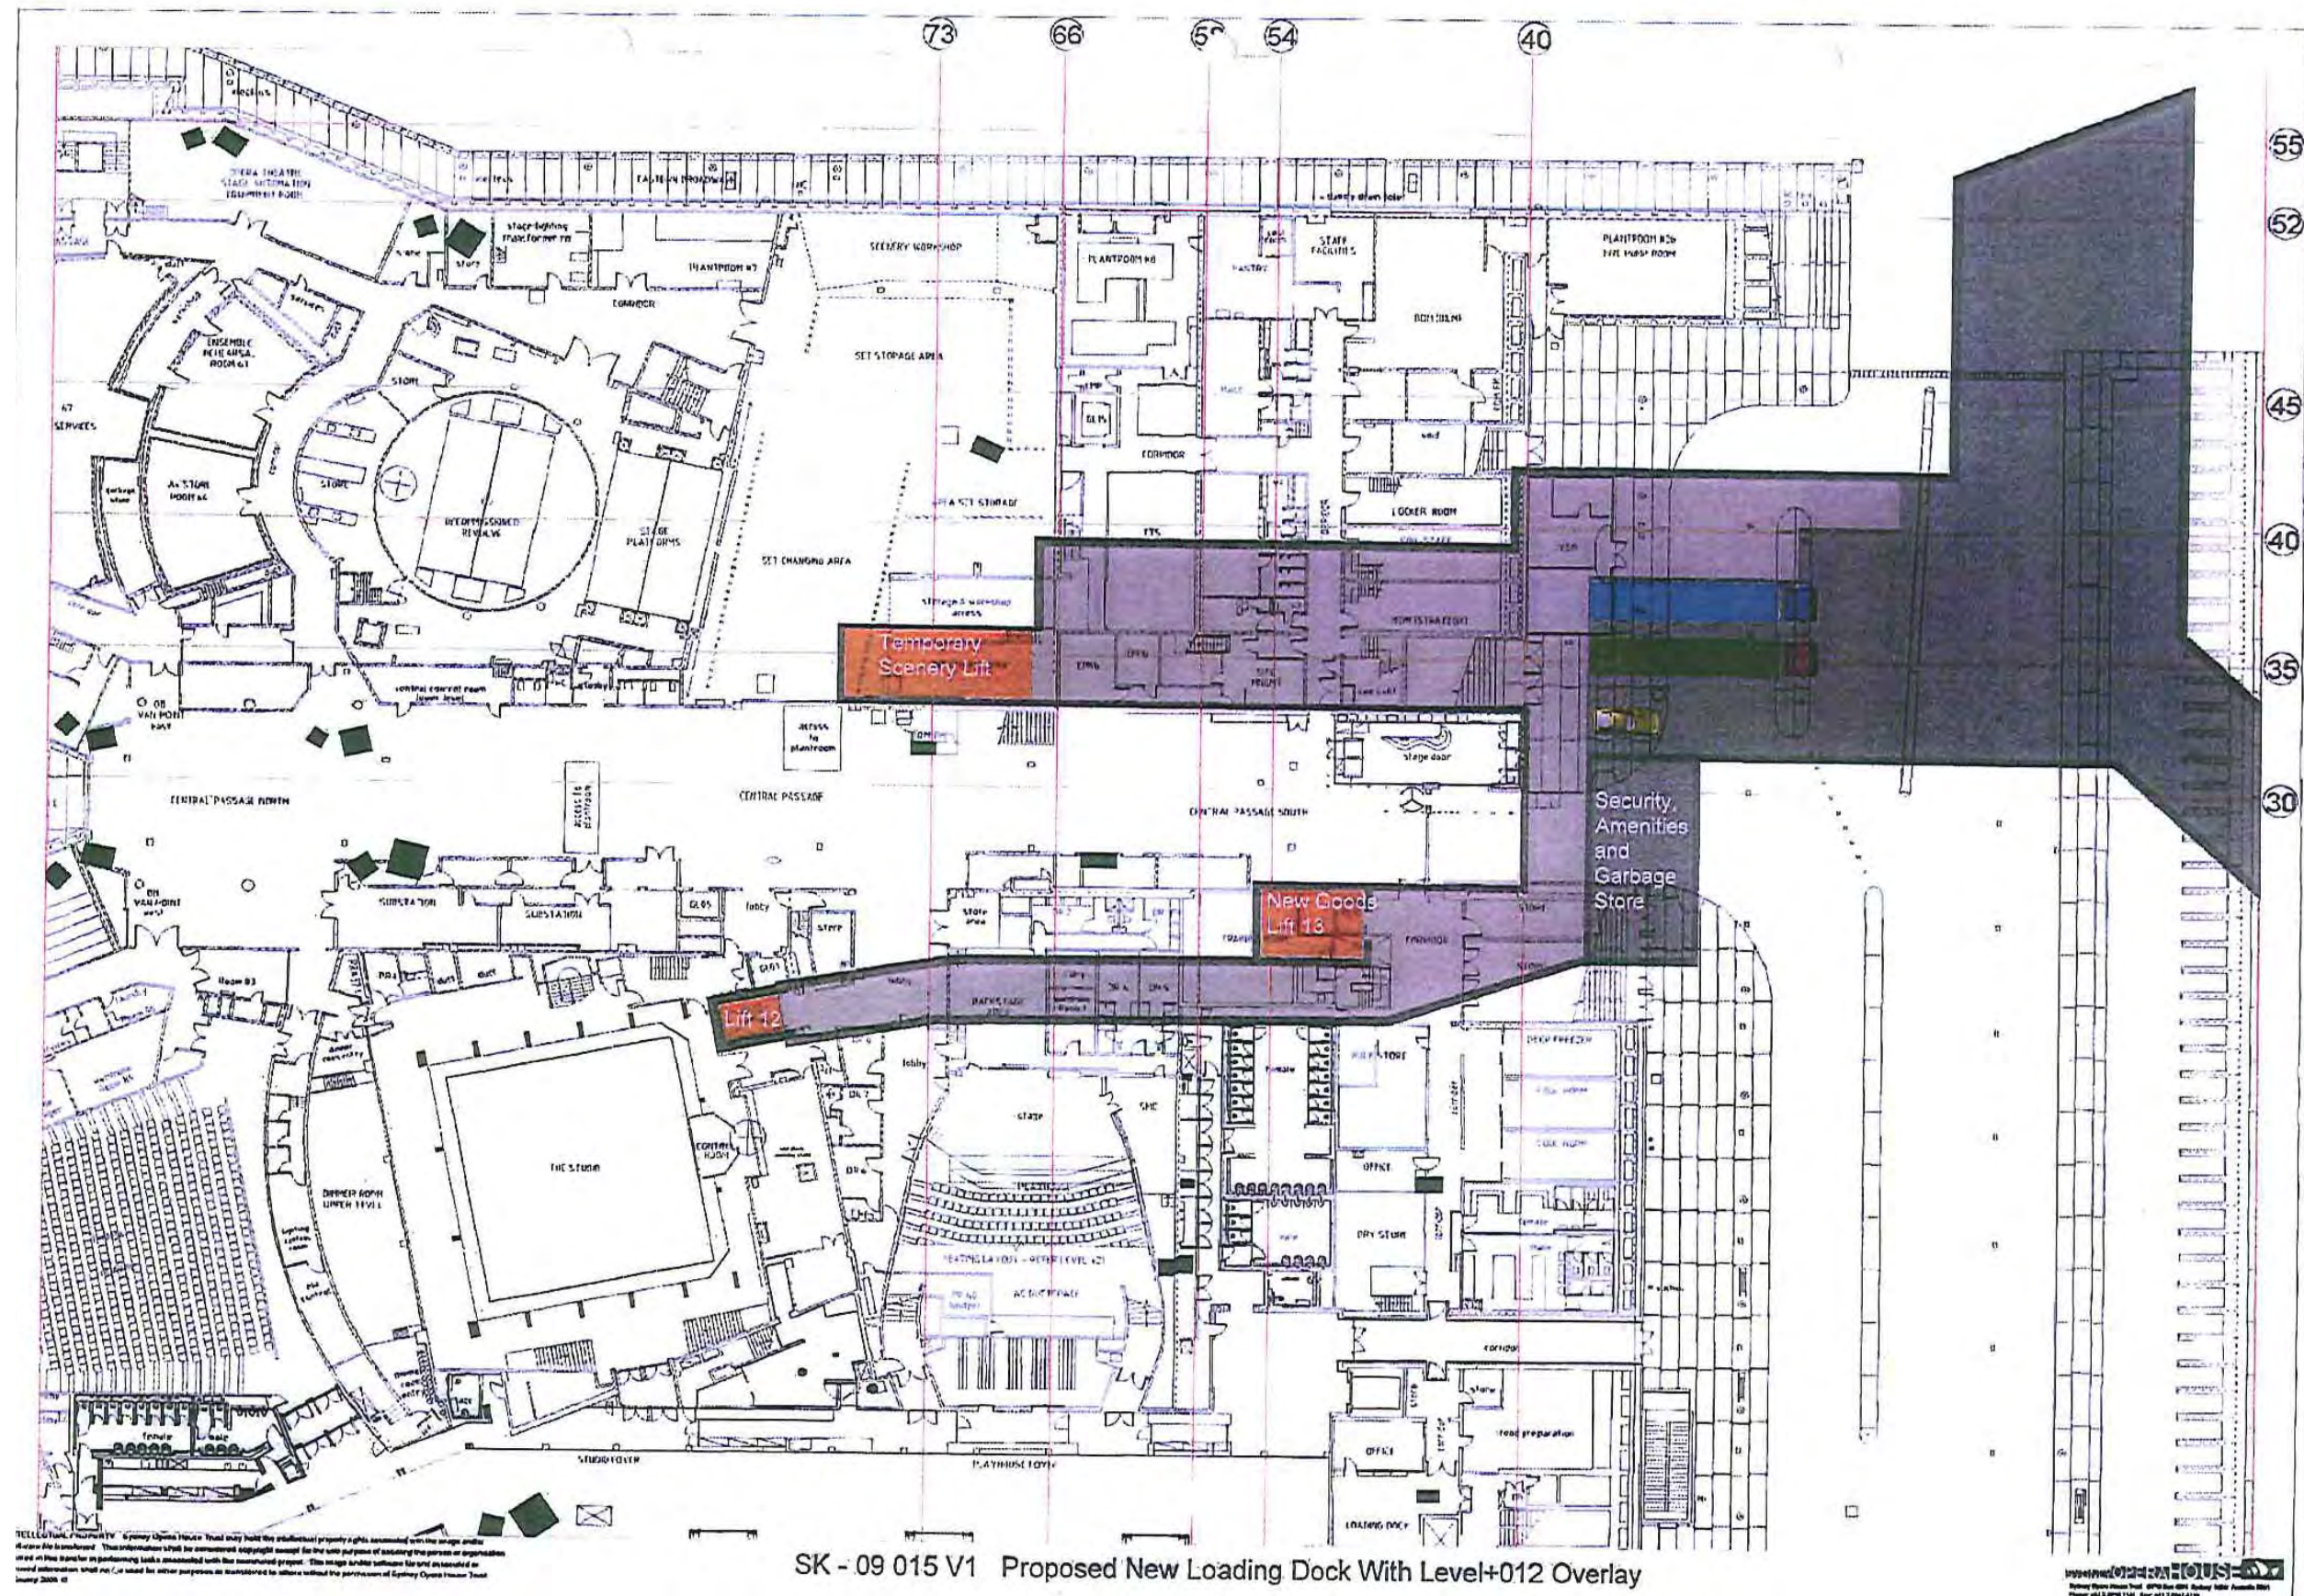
Plan of Sydney Opera House showing details of the proposed new basement level in relation to the existing ground floor layout. (Source: Sydney Opera House Trust)
